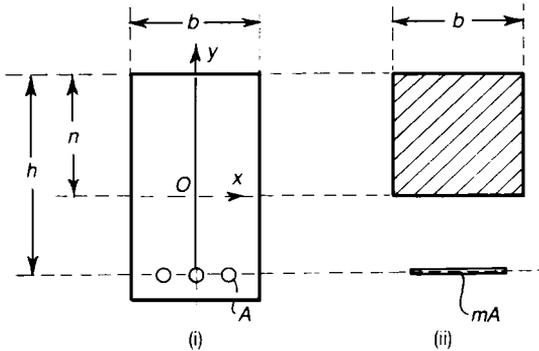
Simple rectangular concrete beam with reinforcing steel in the tension flange.
